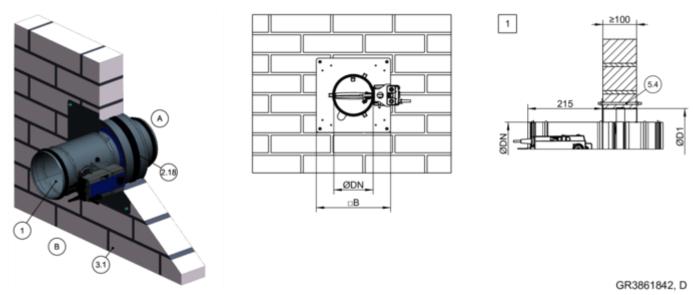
Dry mortarless installation in solid wall with installation block ER
